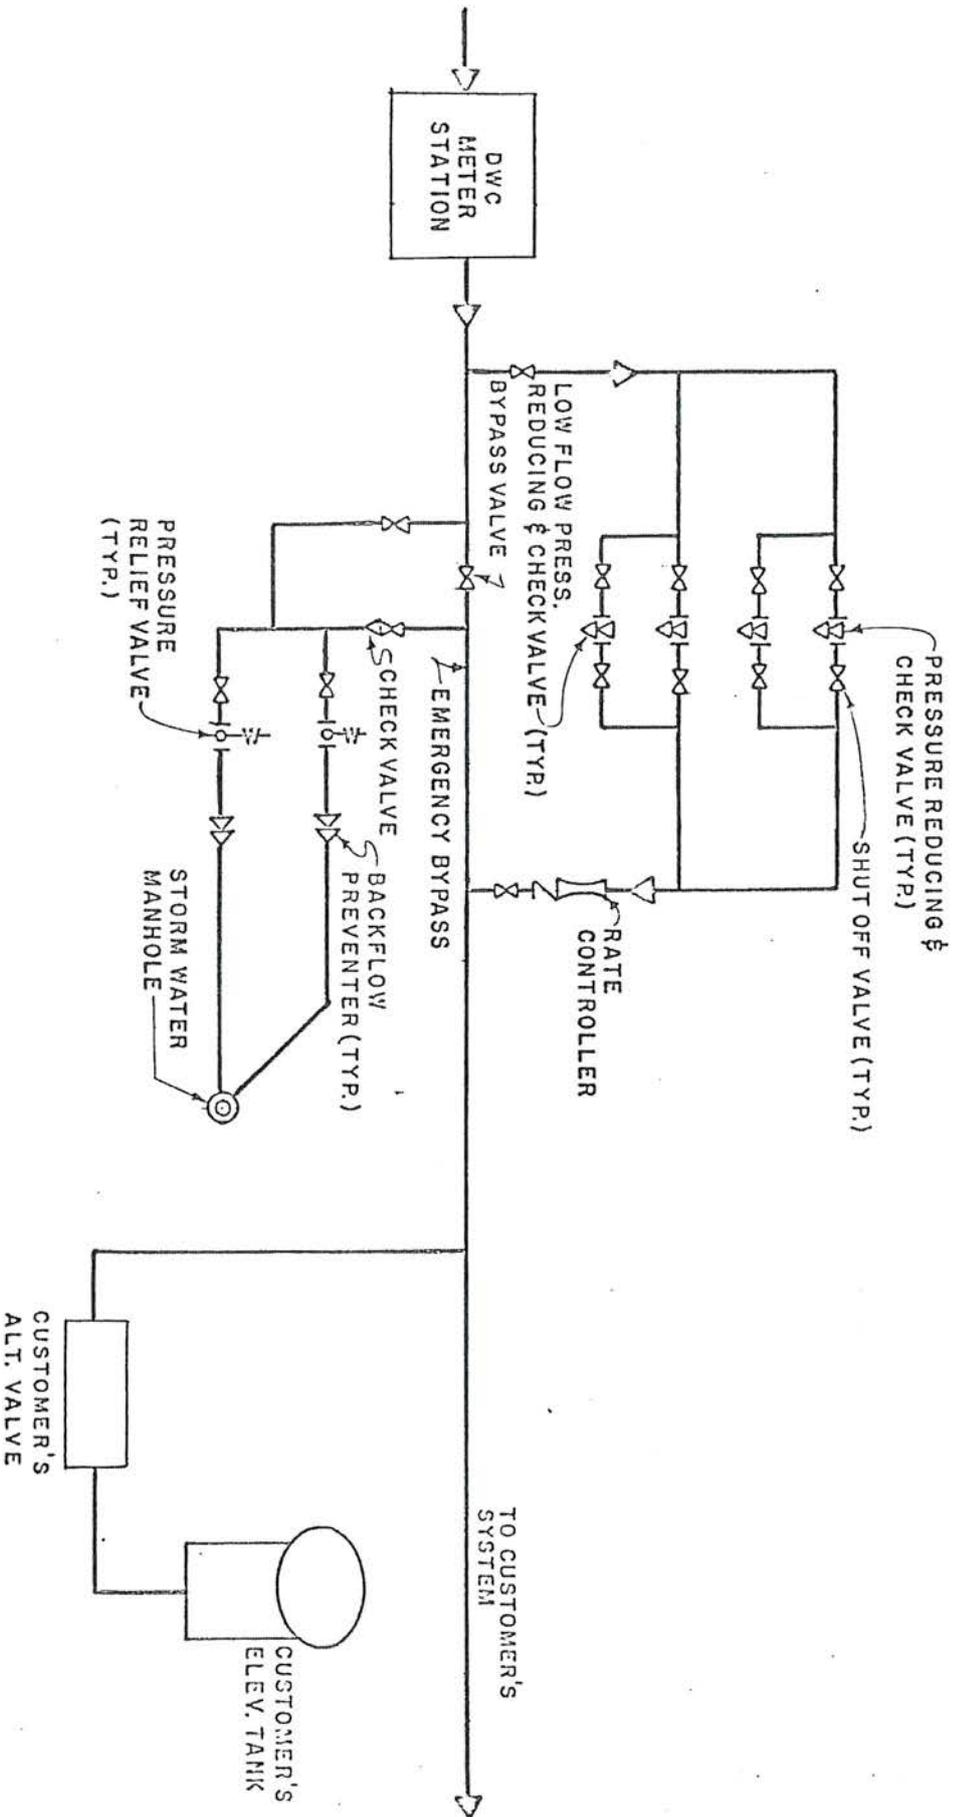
YORKVILLE UNIT SYSTEM CONNECTION FACILITIES
